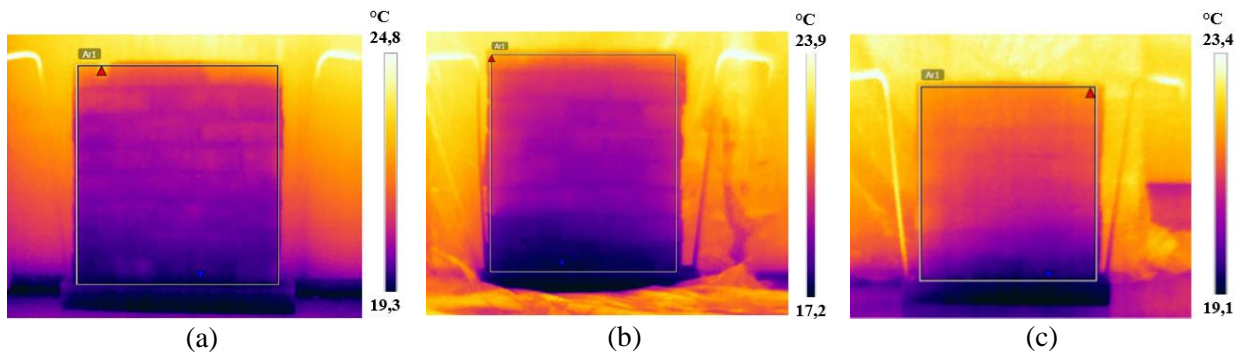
Sample PA2: a) dry wall; b) humid wall; and c) wall at 28 days
